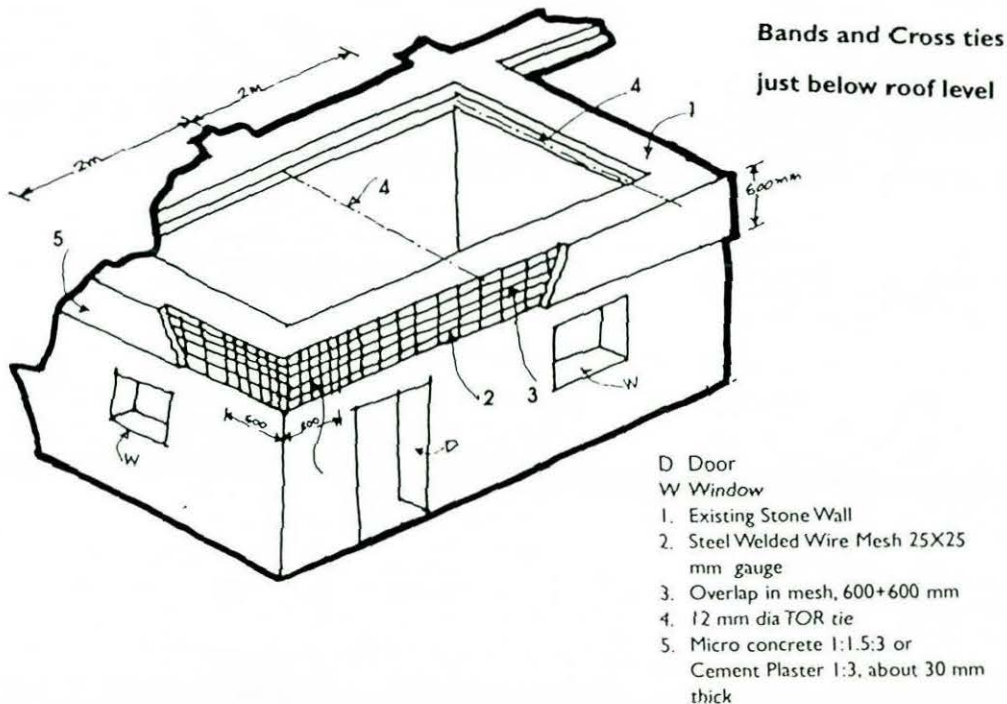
Strengthening existing buildings by installing reinforced concrete bands
